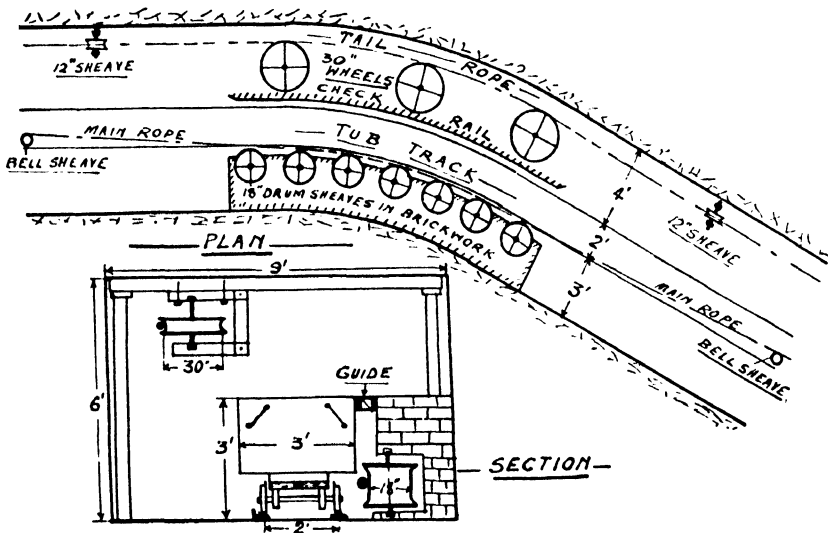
Plan and Section of Main-and-Tail Rope Haulage Curve.
